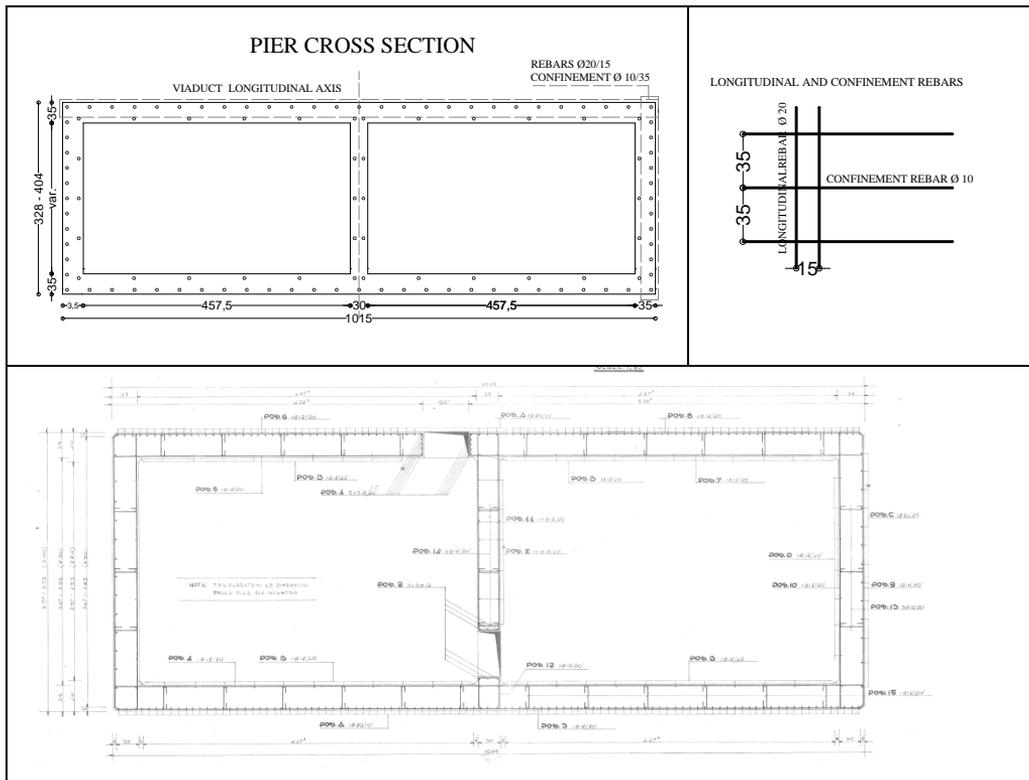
Comparison between structural detail in original design and in situ surveys
